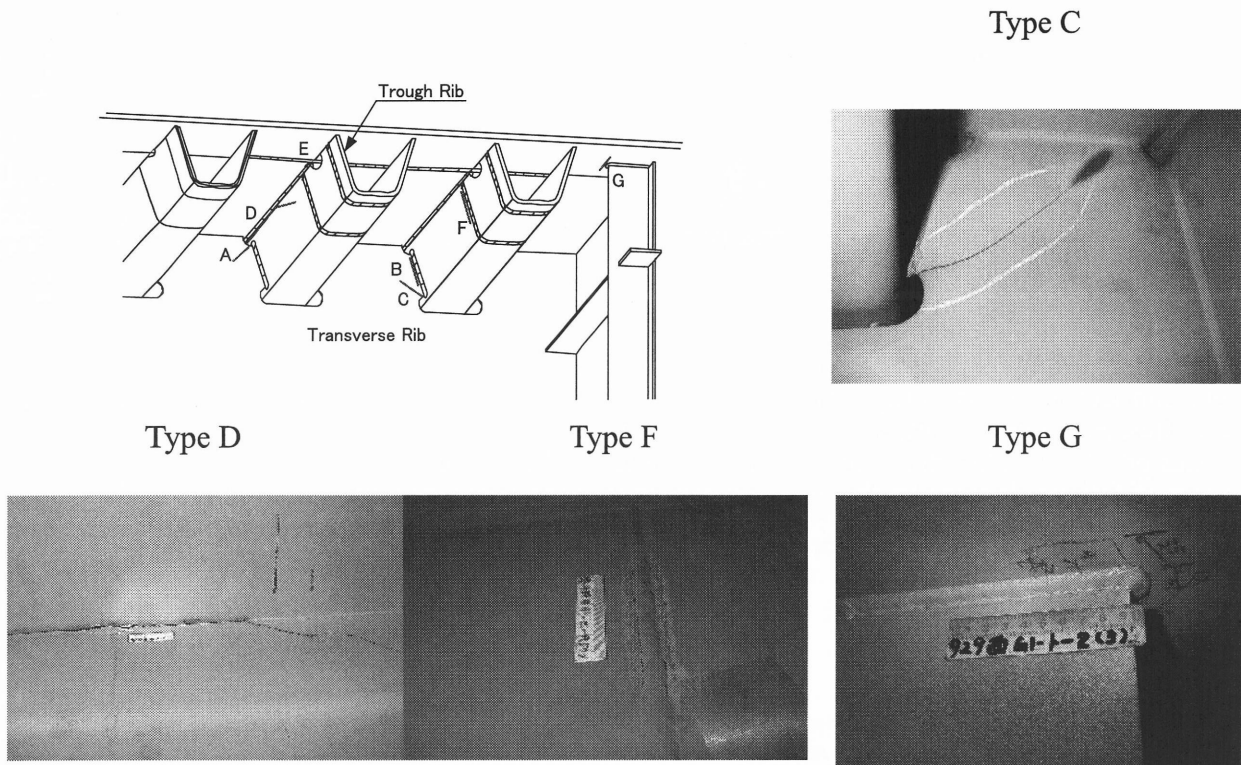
Typical Fatigue Crack in Orthotropic Steel Deck
